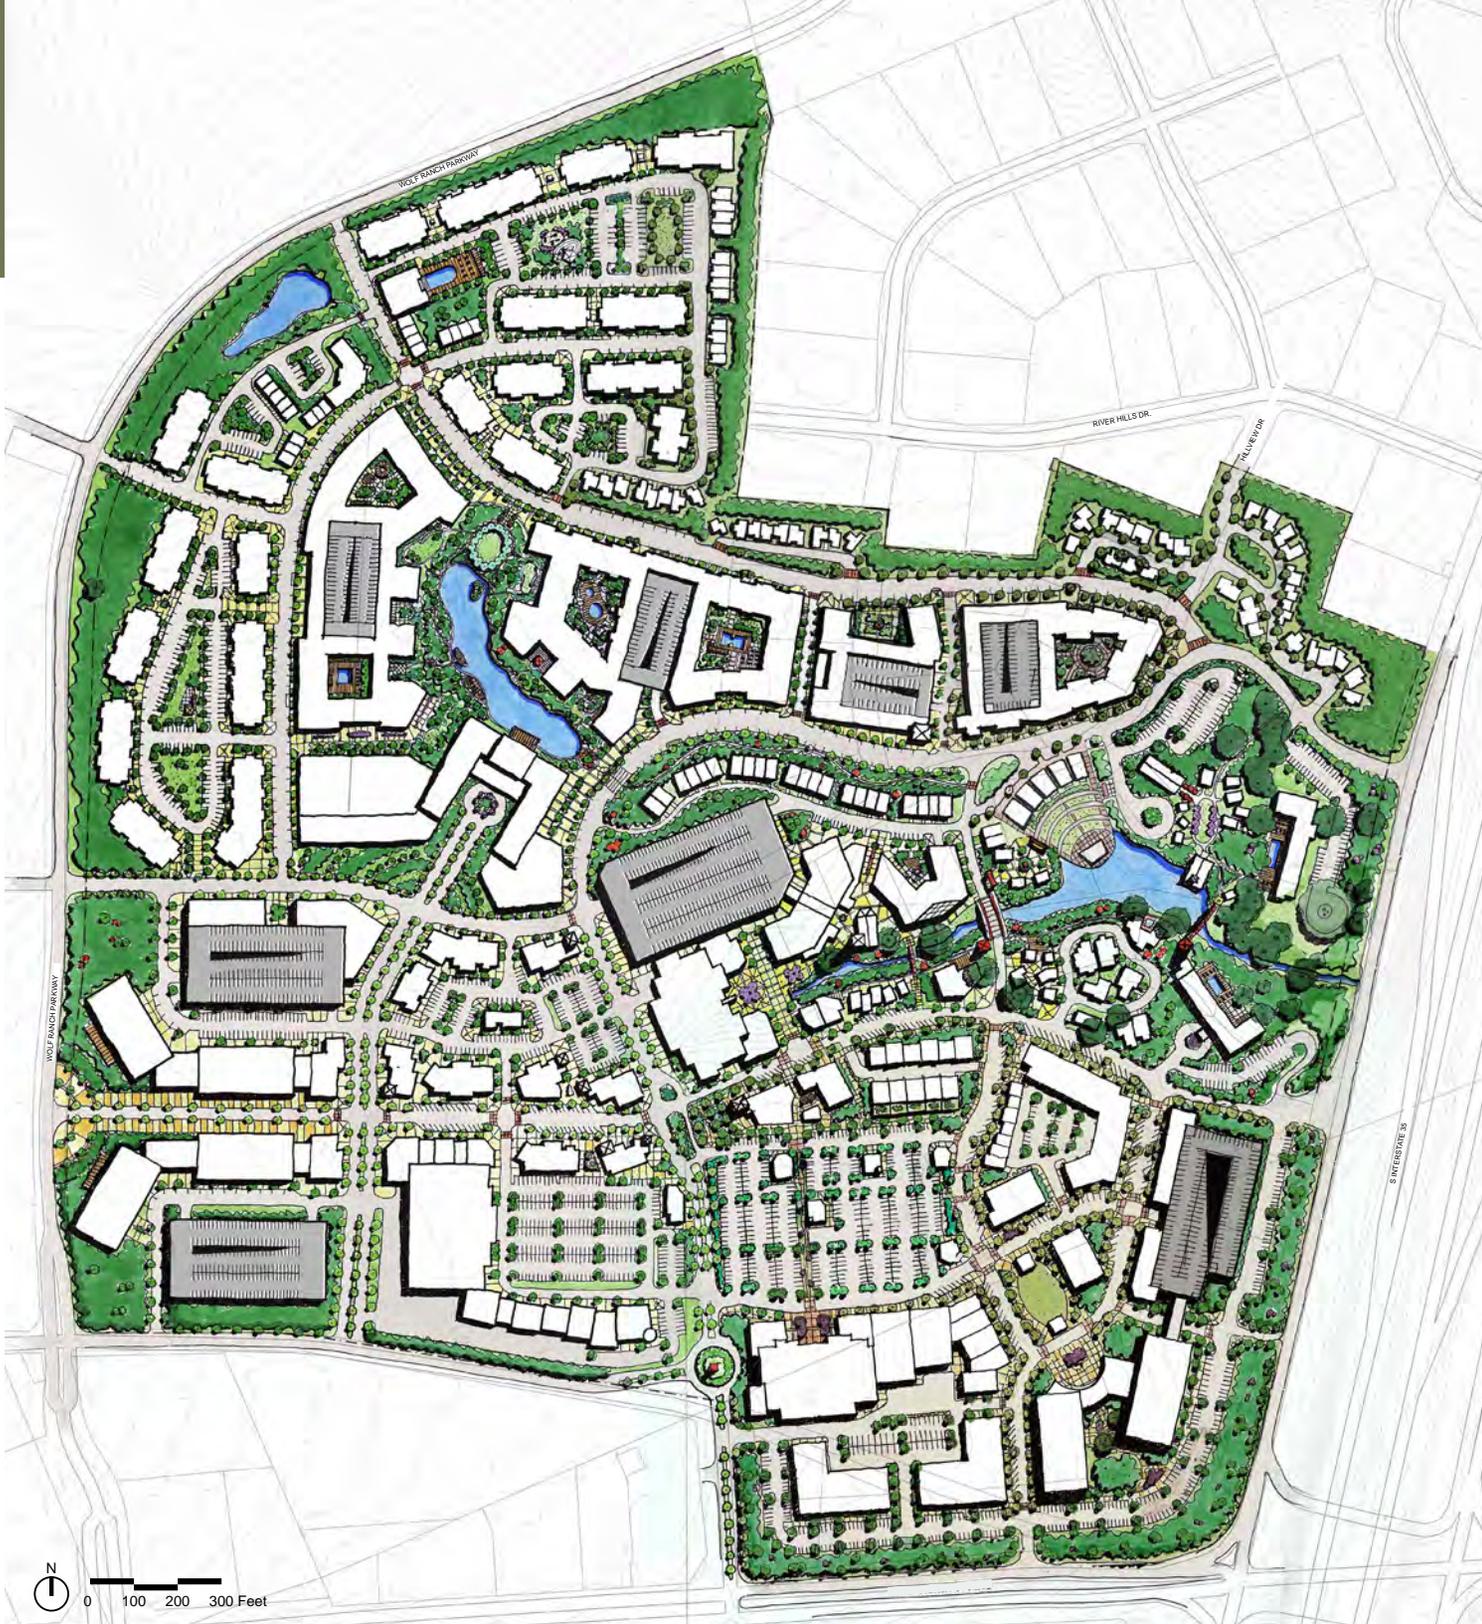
CONCEPTUAL MASTER PLAN
